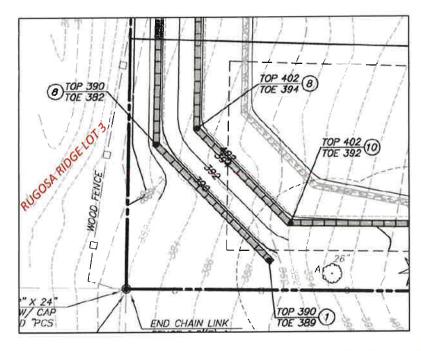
Image showing proposed retaining walls abutting Rugosa Ridge
